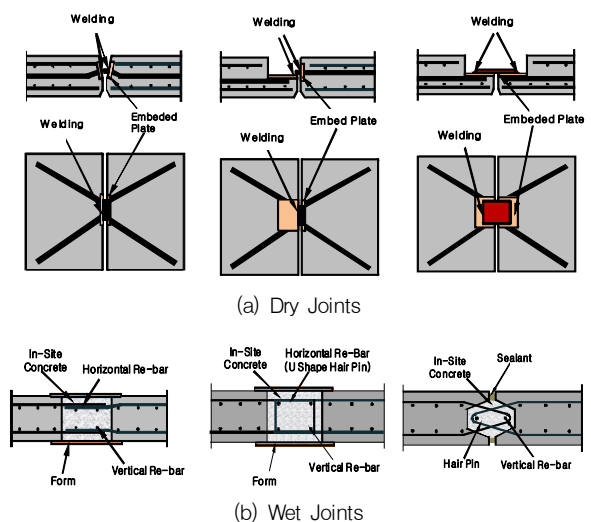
Existed Vertical Joints in Precast Concrete Walls
